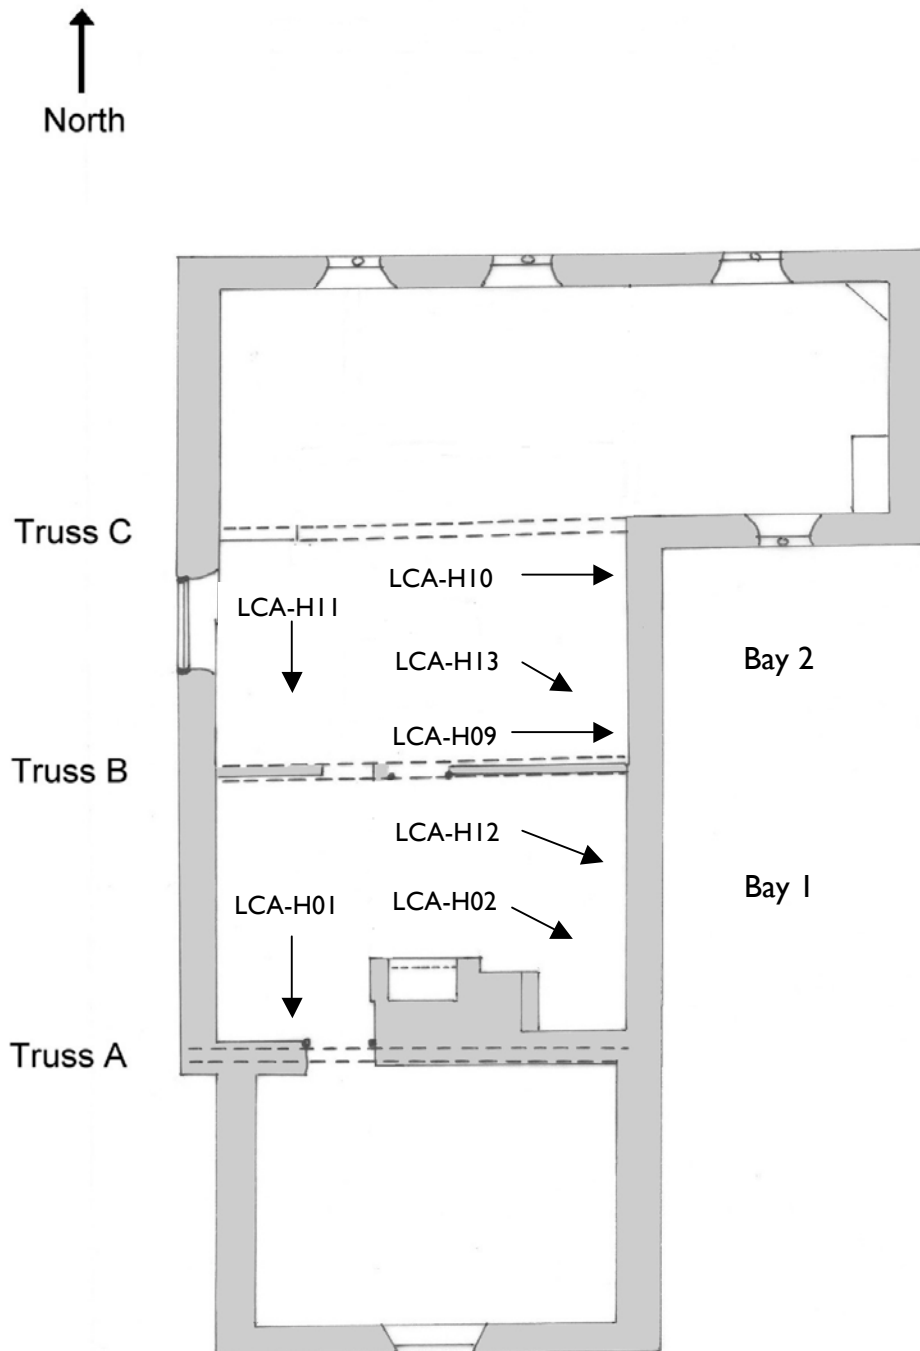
Plan showing the approximate locations of the samples taken from the roof and first floor not shown on the sections below (based on a drawing by Clive Carter of the Wiltshire Buildings Record)
